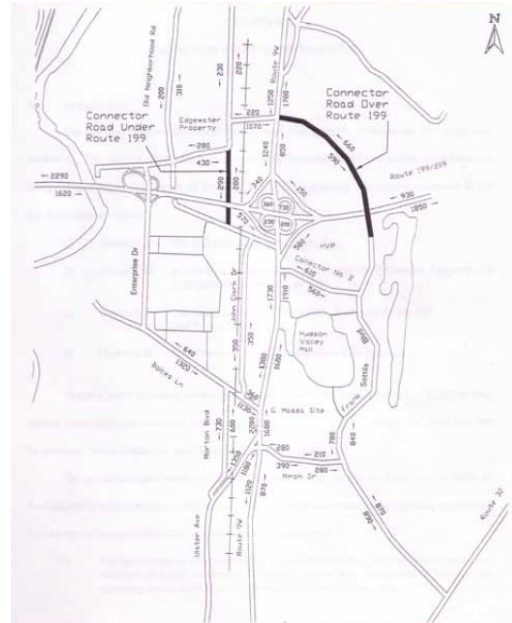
Roadway Connections from Town Comprehensive Plan (2007)
